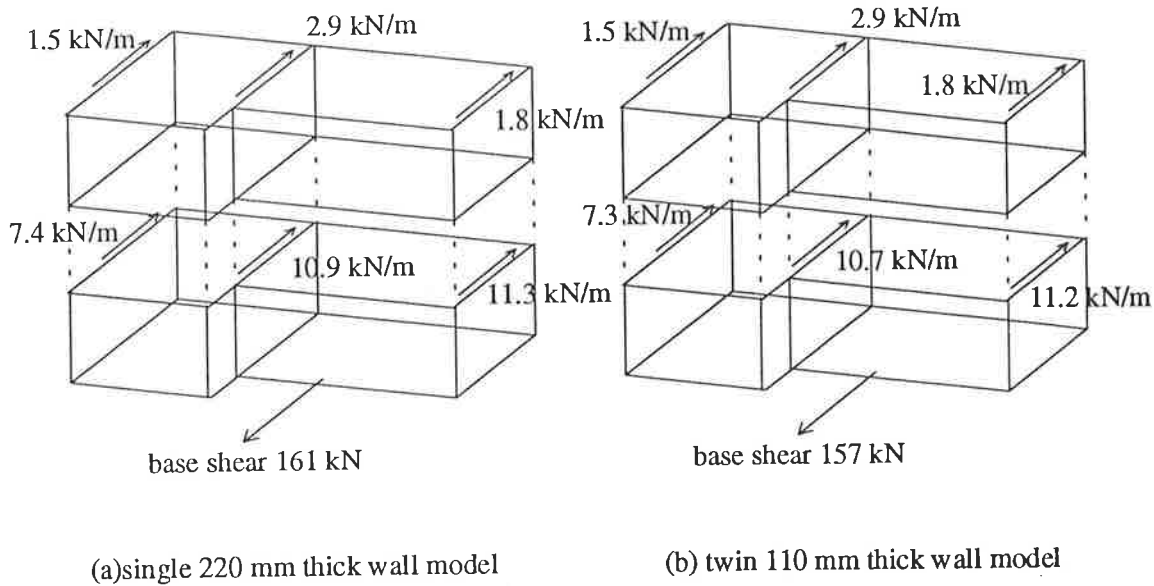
Two Storey Apartment Building - Connection Force Comparison : Single Wall versus Twin Wall.
